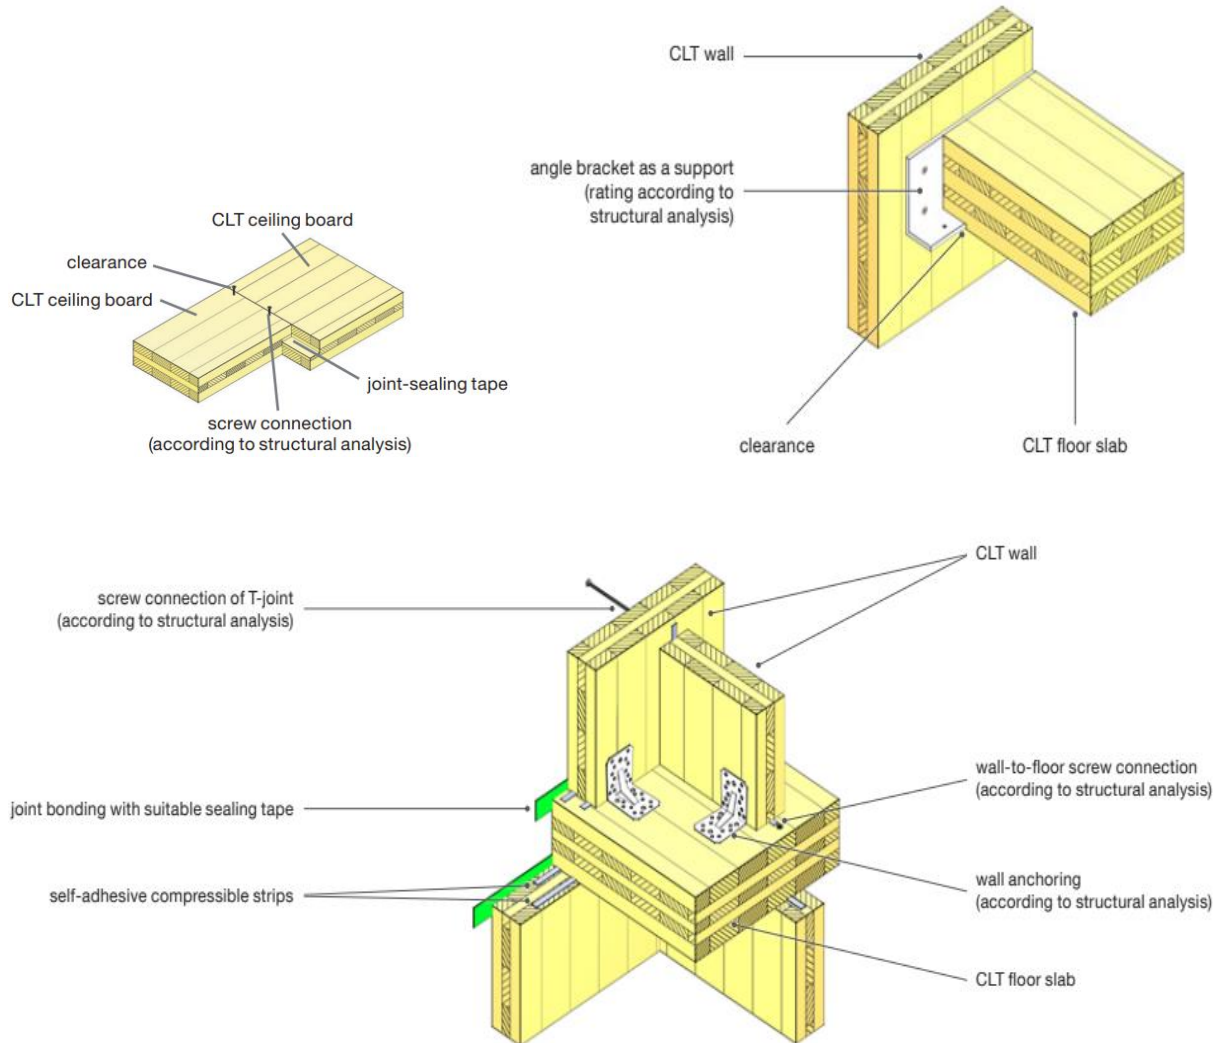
Examples of fasteners used in CLT buildings (Stora Enso, 2017)
